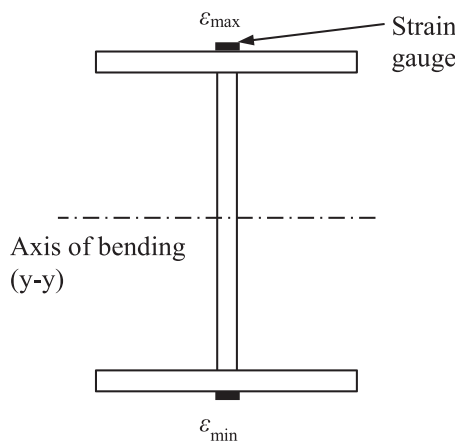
Strain gauge arrangement for specimens under combined axial compression and major axis bending.
